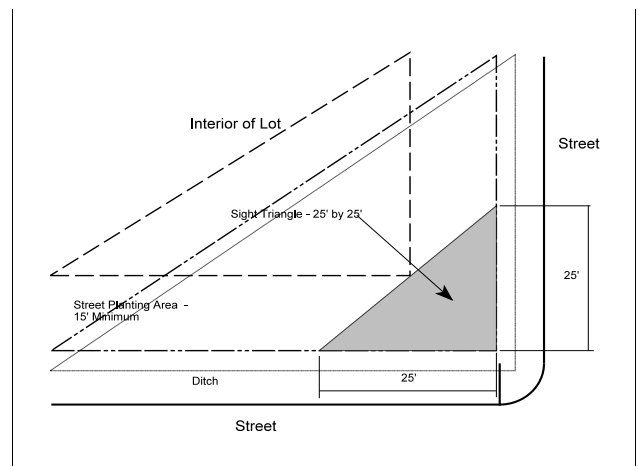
Sight Triangle for the Intersection of Two Streets
